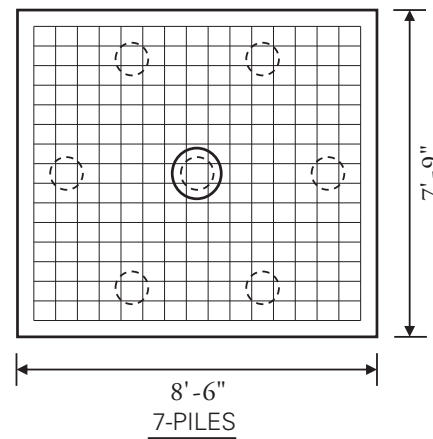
Reinforcement Summary for design example #4: Use 16 #6 bars each way.
